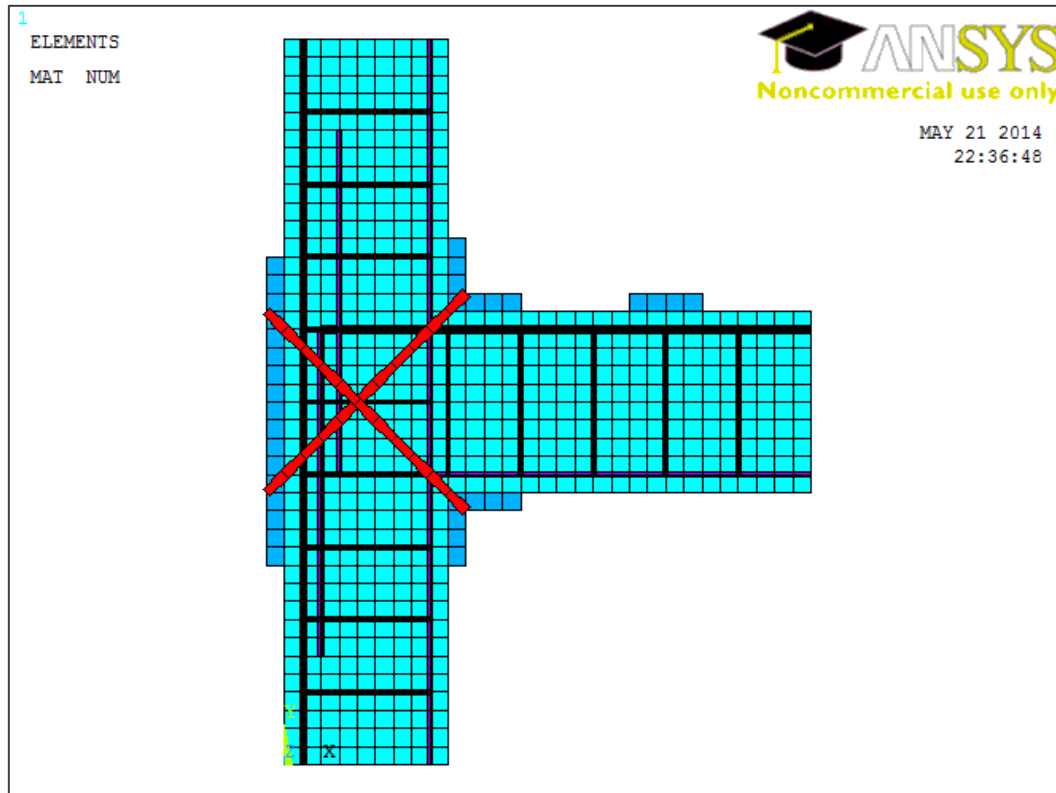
Side view of the proposed Exterior Beam-Column Joint by present work.
